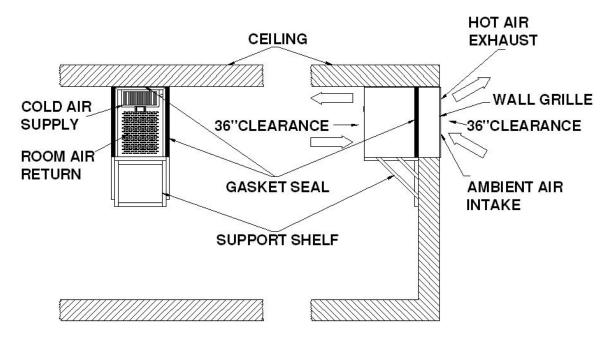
THROUGH-WALL INSTALLATION (OUTSIDE WALL FLUSH)
